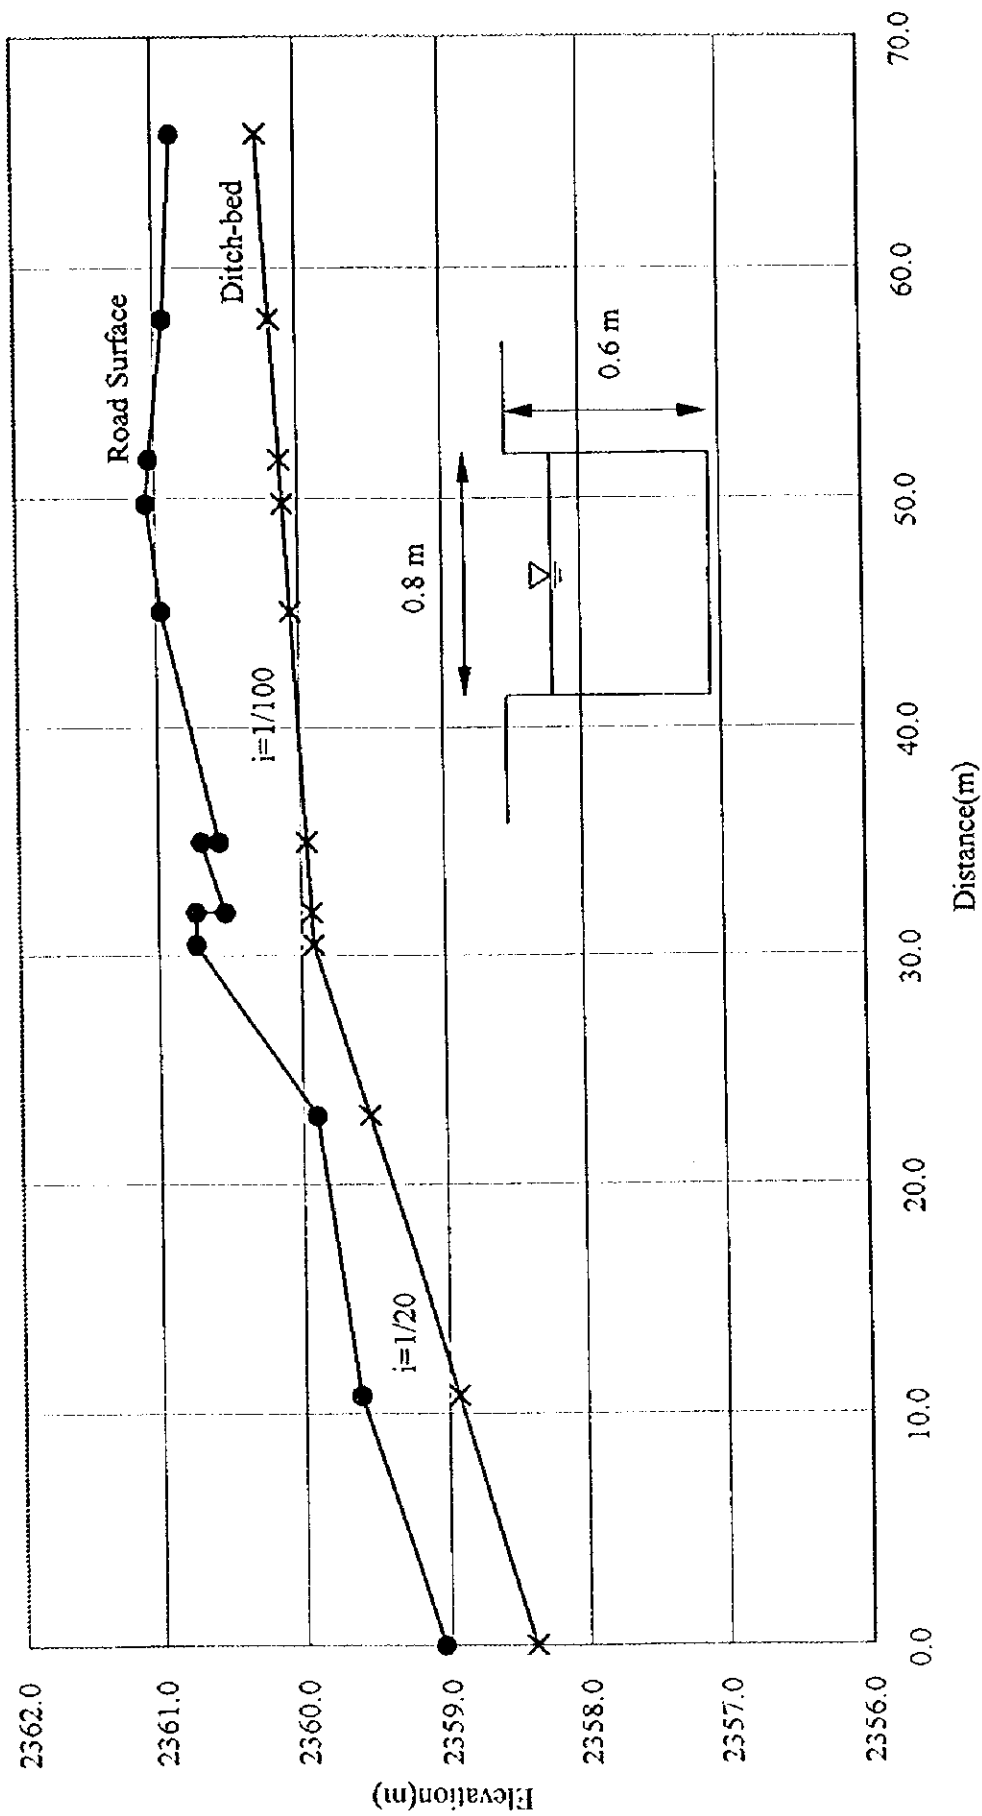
Longitudinal and Cross-sectional Profiles of Drainage Ditch for Northern Basin
